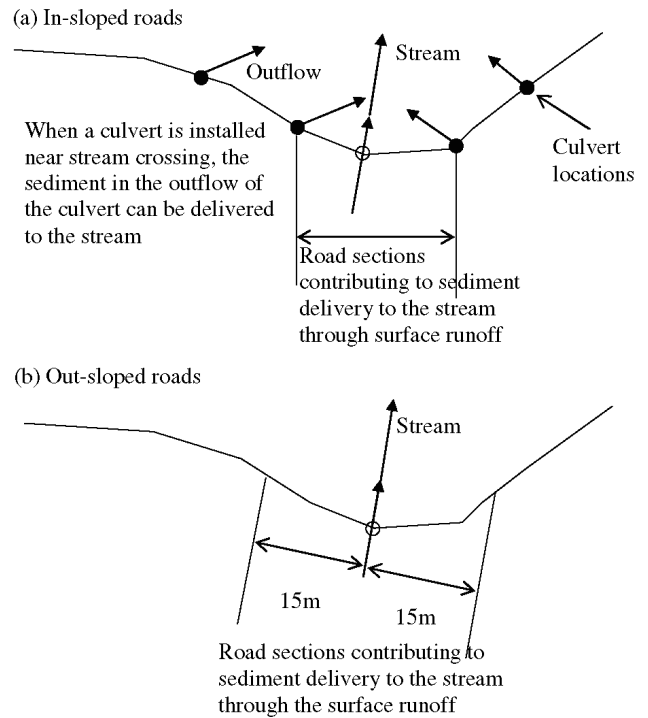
~ A plan view showing culvert locations, the outflow of culvert and road sections contributing to sediment delivery to the stream: (a) in-sloped roads and (b) out-sloped roads.
